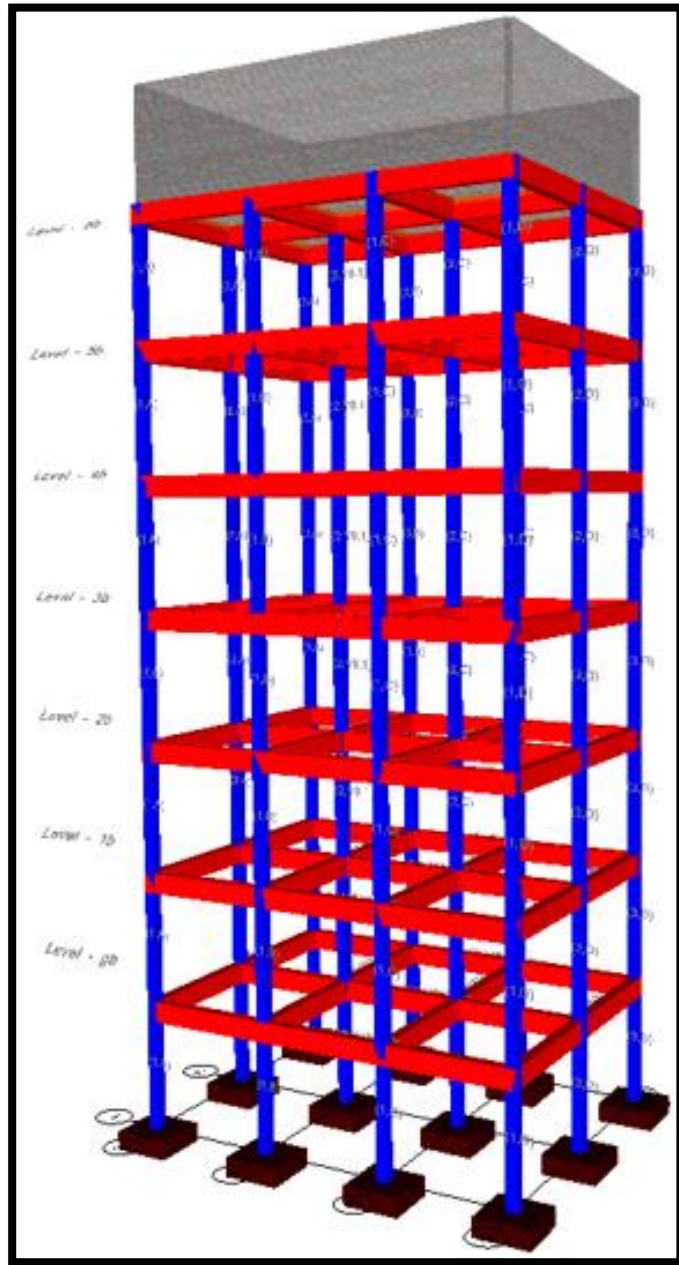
Three dimensional drawing of 7 storeys elevated RC water tank model
